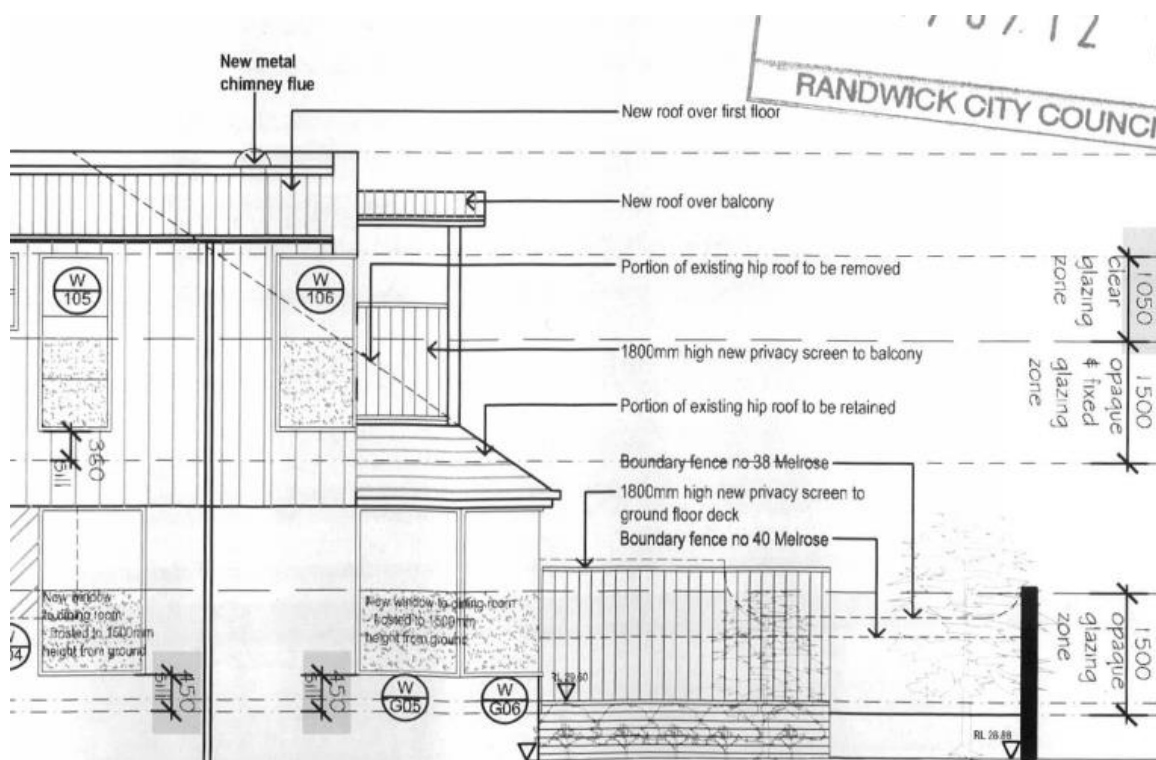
Insert from approved eastern elevation of 38 Melrose Parade.
